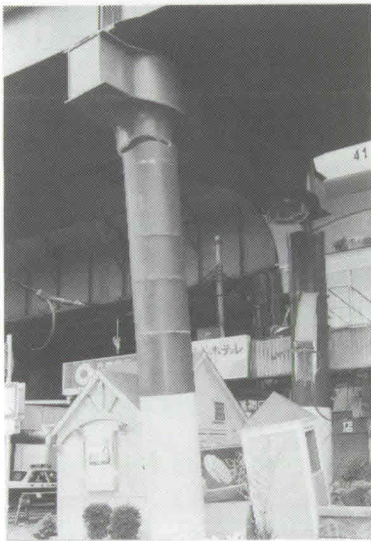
Brittle failure of steel piers (near Sannomiya Station, Kobe Express Railway)
